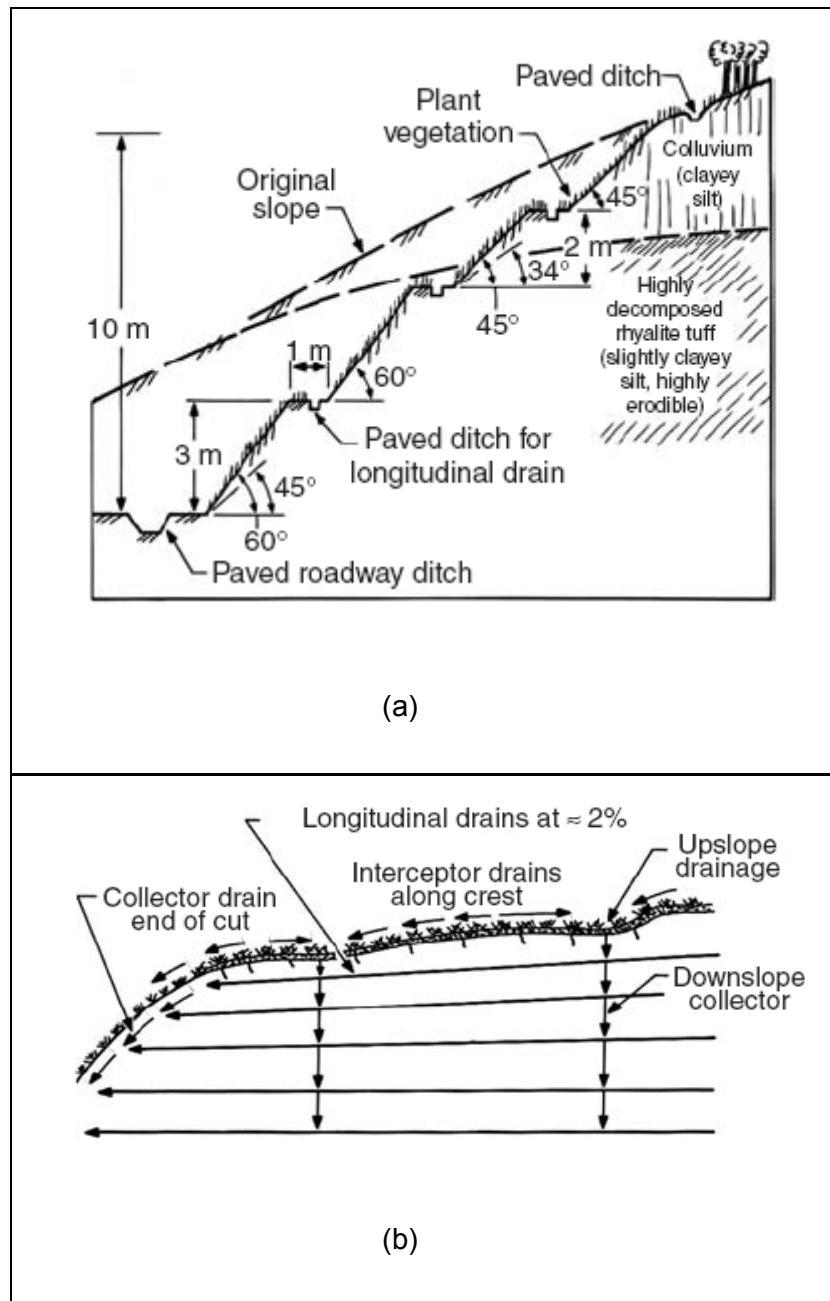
a. Benching scheme for cut (low benches permit maximum inclination to reduce the effect of runoff erosion), b. Longitudinal and downslope drains (Hunt, 2005)
